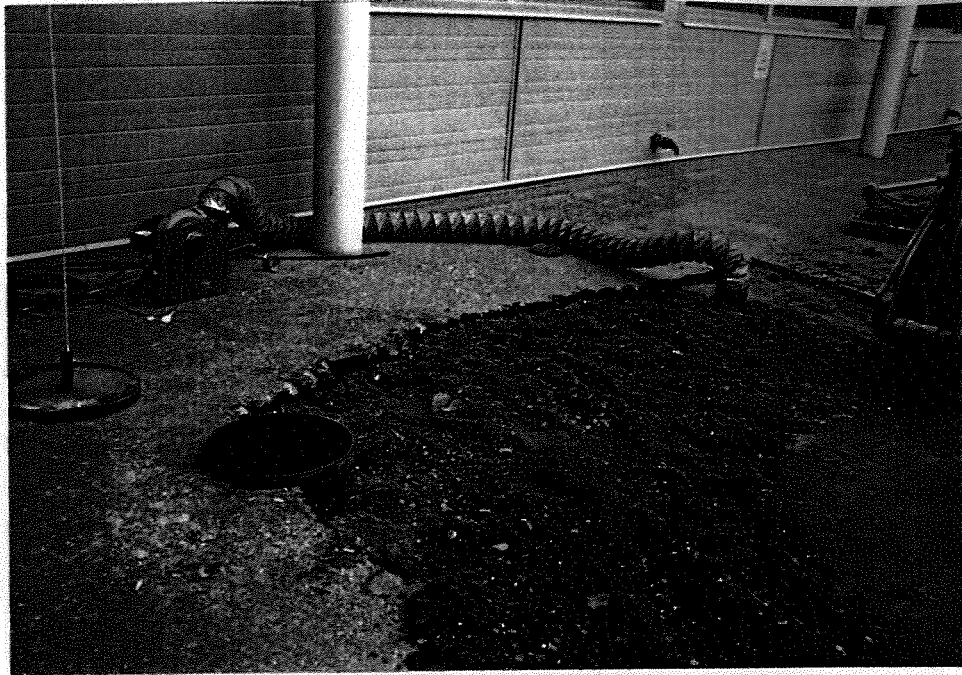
City of Fairbanks Department of Public Works used oil tank, prior to excavating, looking northwest.
